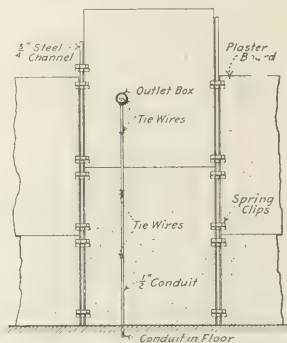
OUTLET BOX AND CONDUIT WIRED TO PARTITION
